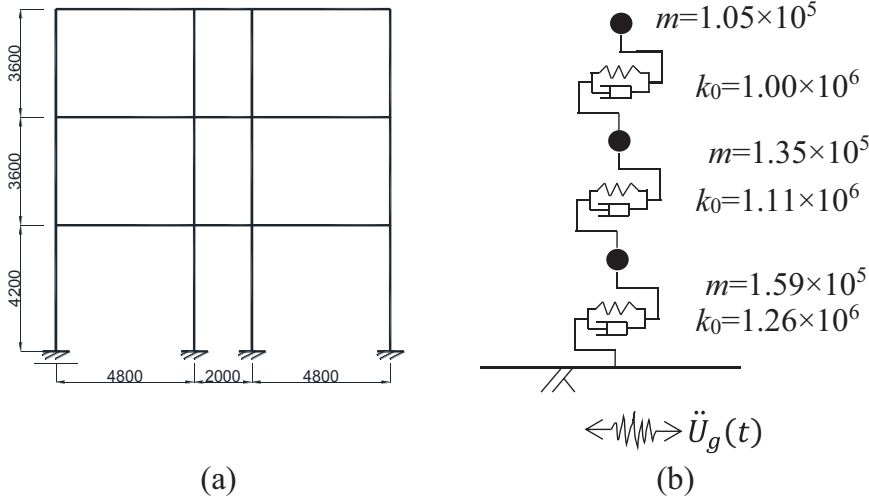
Frame structure and its simplified dynamic model: (a) frame structure model (unit: mm) and (b) shear-building model (unit: 105 kg; 106 kN/m).
